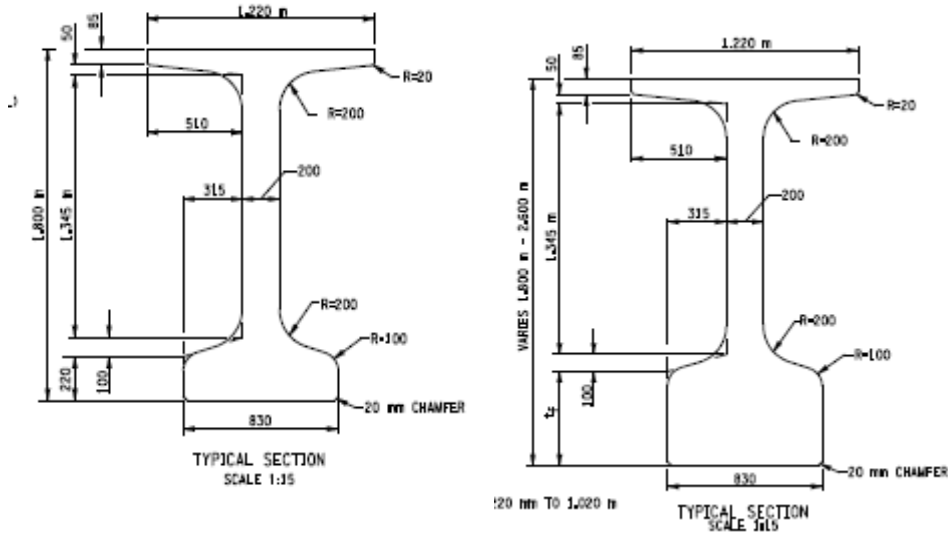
Girder sections, deepened bottom flange at the intermediate support
